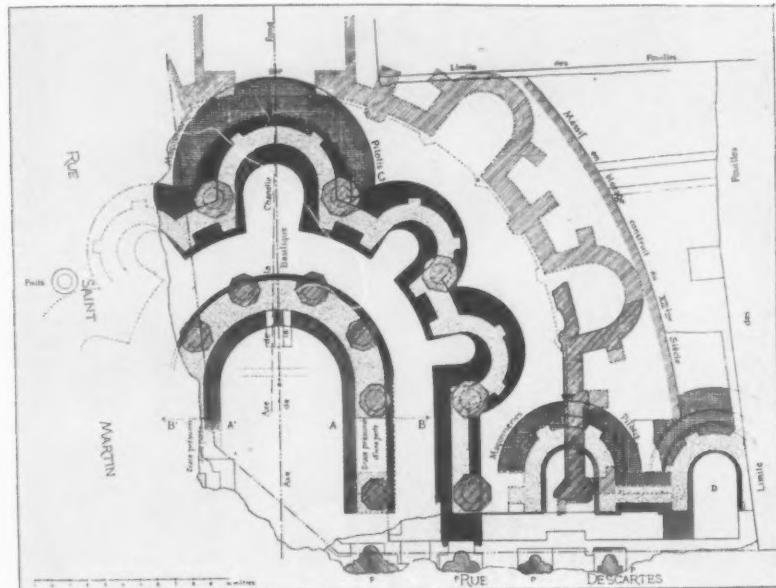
Plan of Excavations of 1886 (Parcq, Lasteyrie)
